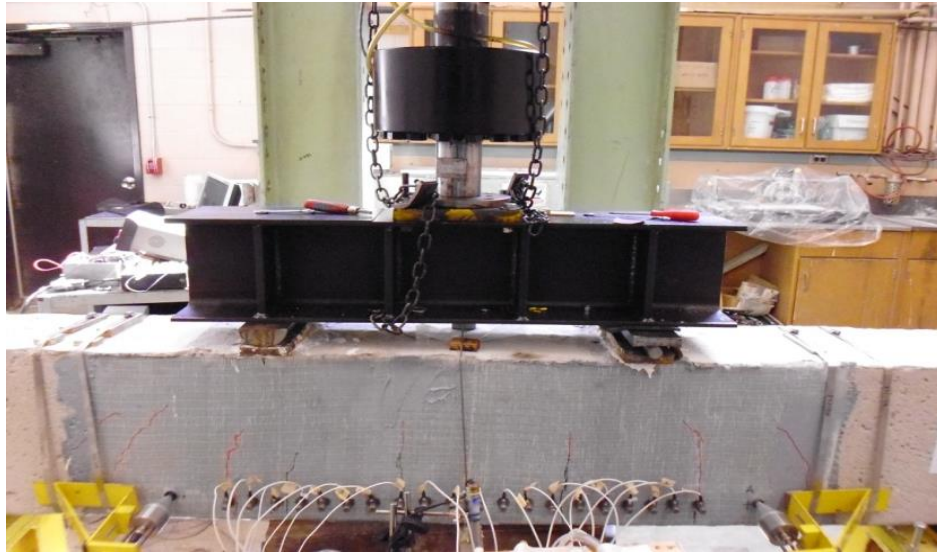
Setup for the surface wave analysis test of a reinforced concrete beam with GFRP reinforcement
